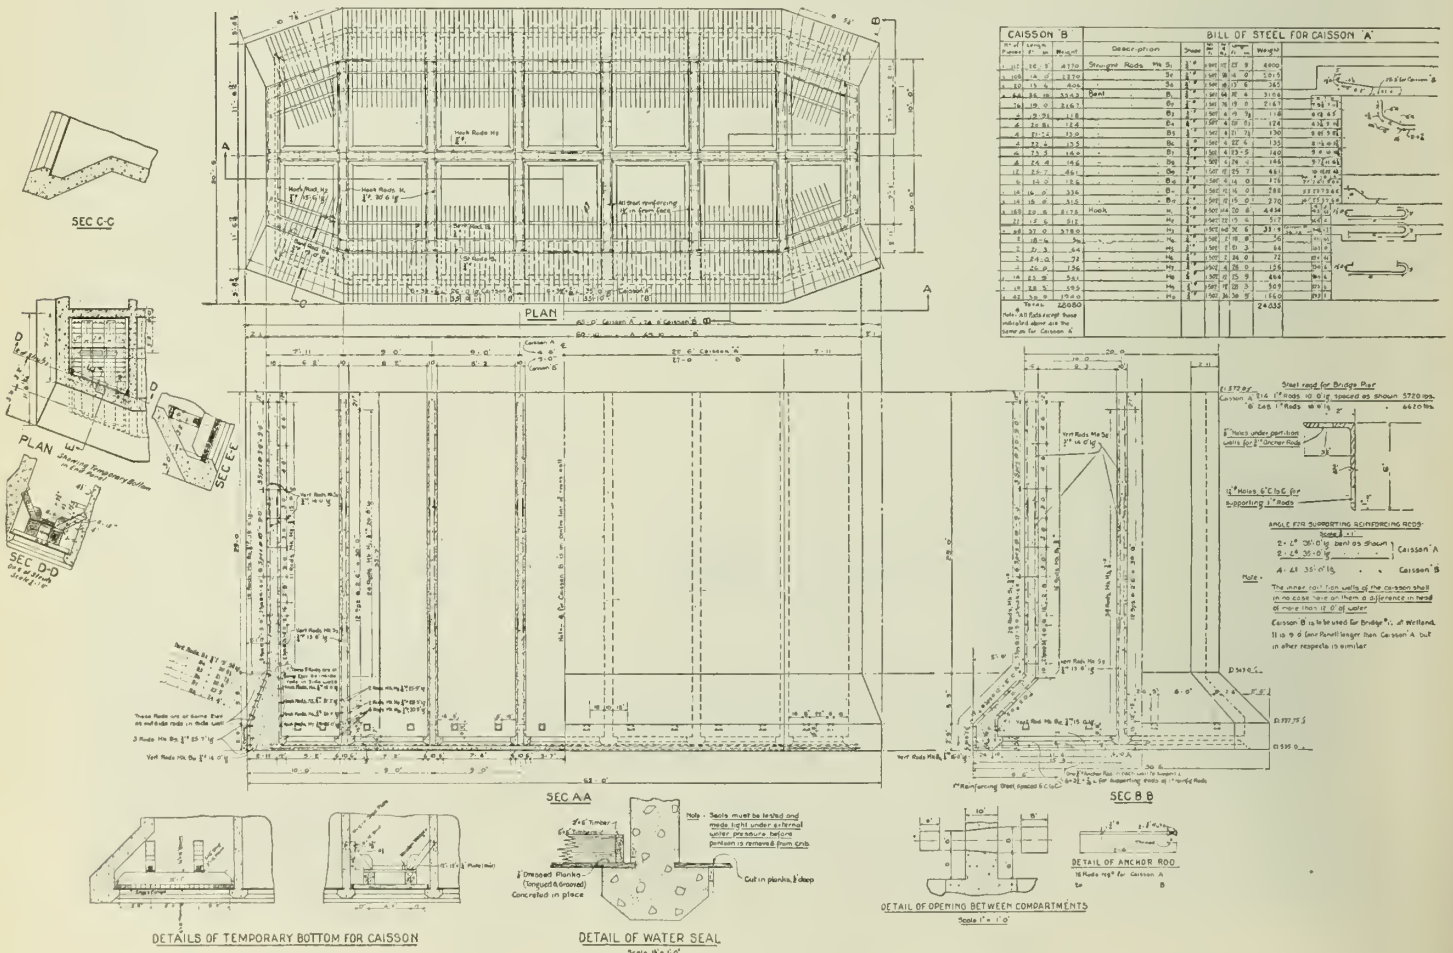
Bridge Pier Caisson—General Plan and Details of 65' x 25' Reinforced Concrete Caisson.
